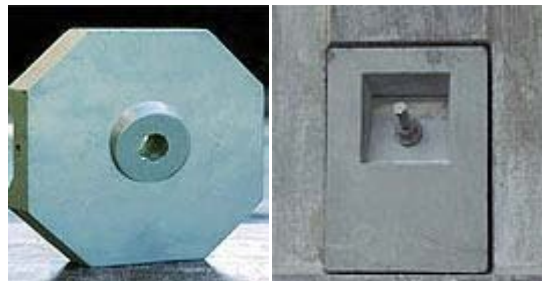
Anchor plates for seawall on Reunion Island (left) and soil wall in Calgary (right) (Lafarge North America 2007)
